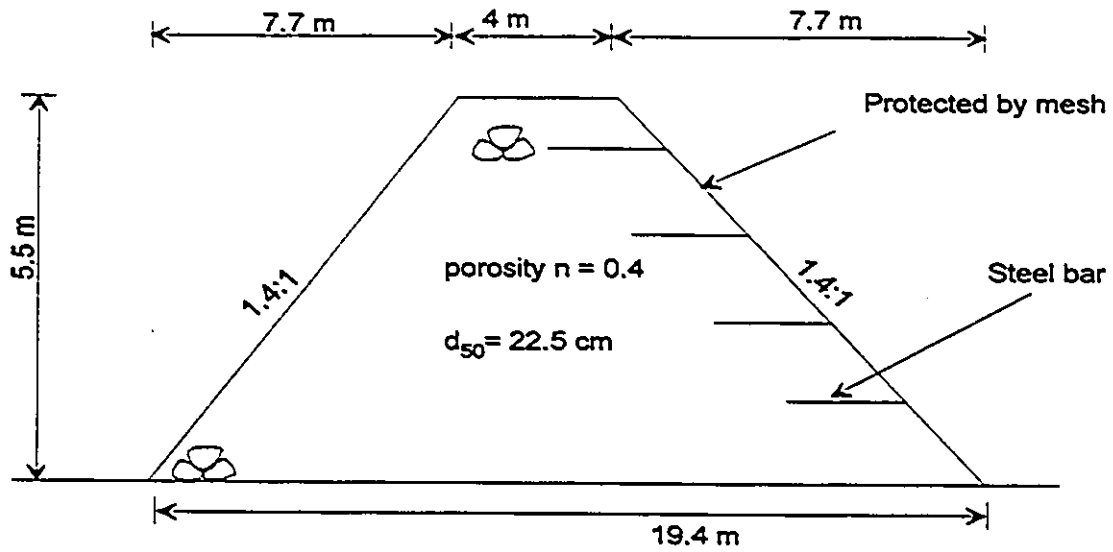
An overtopped rockfill dam protected by steel mesh and steel bars
